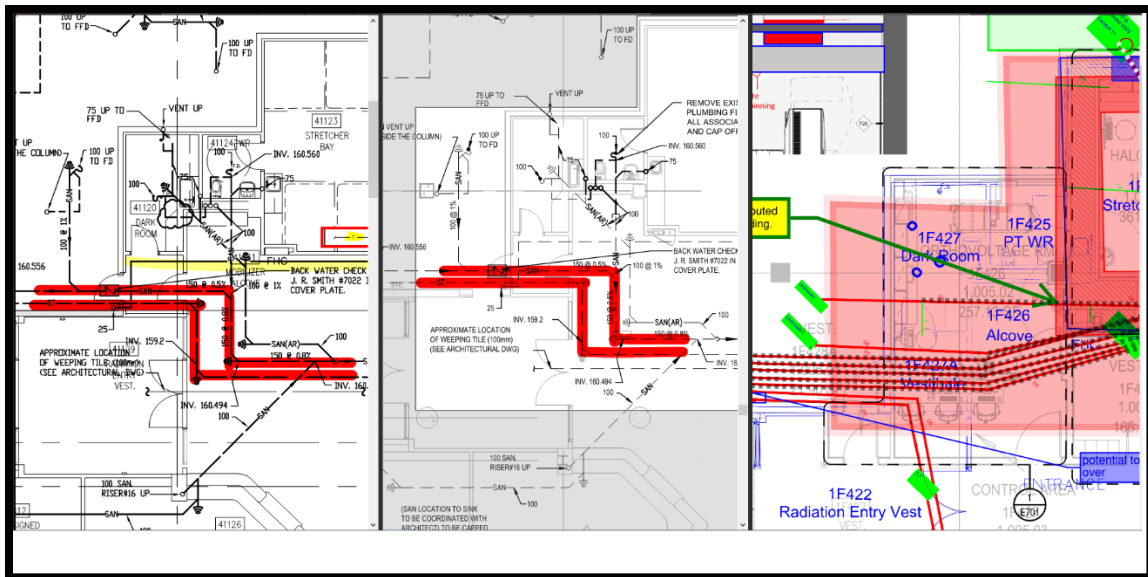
Comparison between underground piping scan for Halcyon #3 and existing drawings
